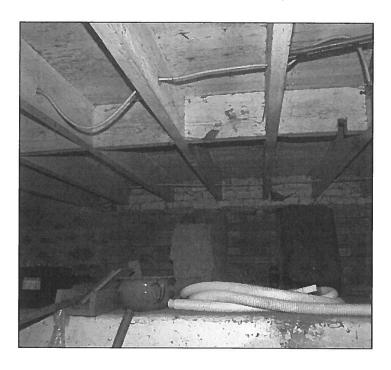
Above: Looking west to brickwork in basement, with rubblestone wall on the left, 2016.
